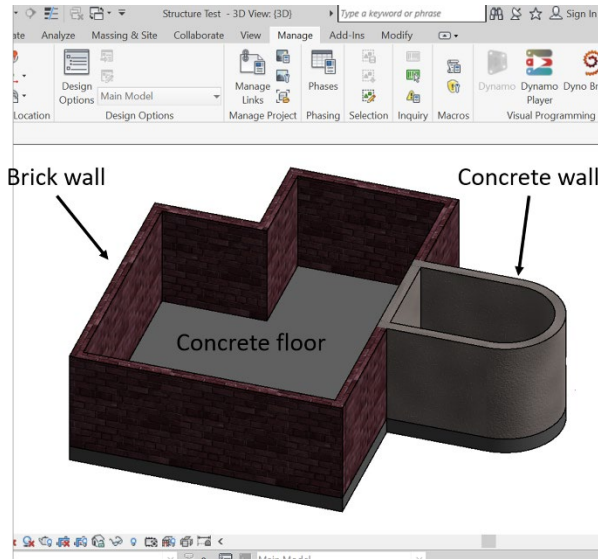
Sample Revit model composed of a concrete wall, a brick wall as well as concrete floor
